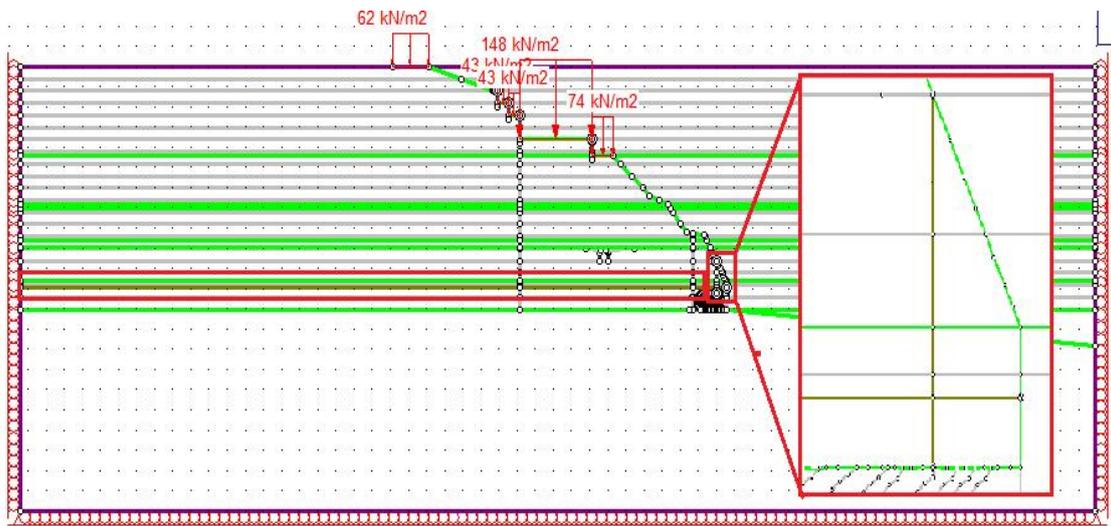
Highlights Joints & magnify the vertical joint along with dimensions
